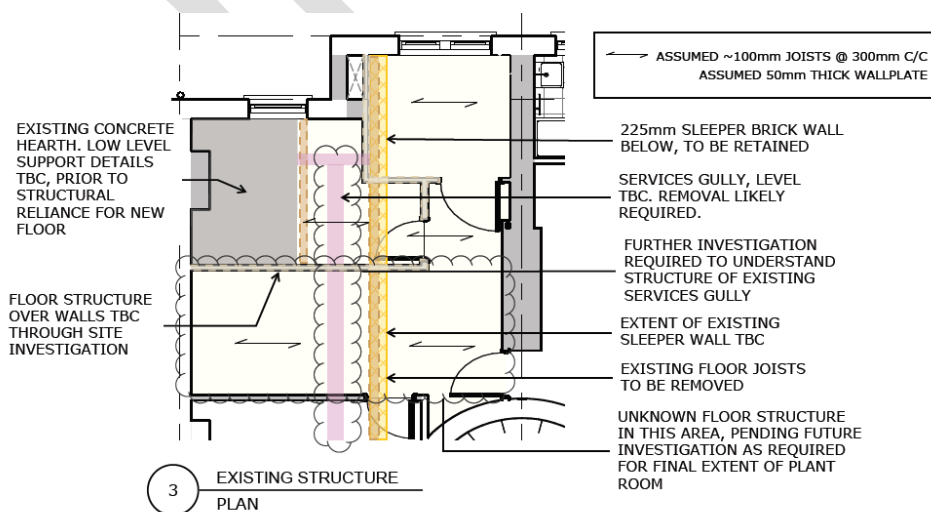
The existing structure has been investigated through the lifting of floorboards to allow a visual, tactile, photographic structural survey to be carried out.
